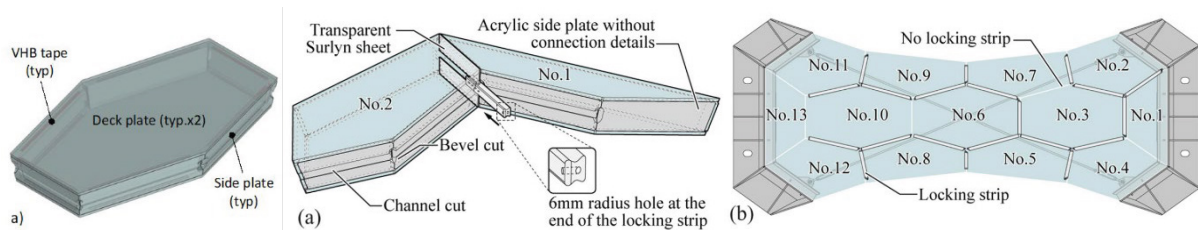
a A typical connection between two HGUs; b Assembly sequence and corresponding locations of the locking strips
